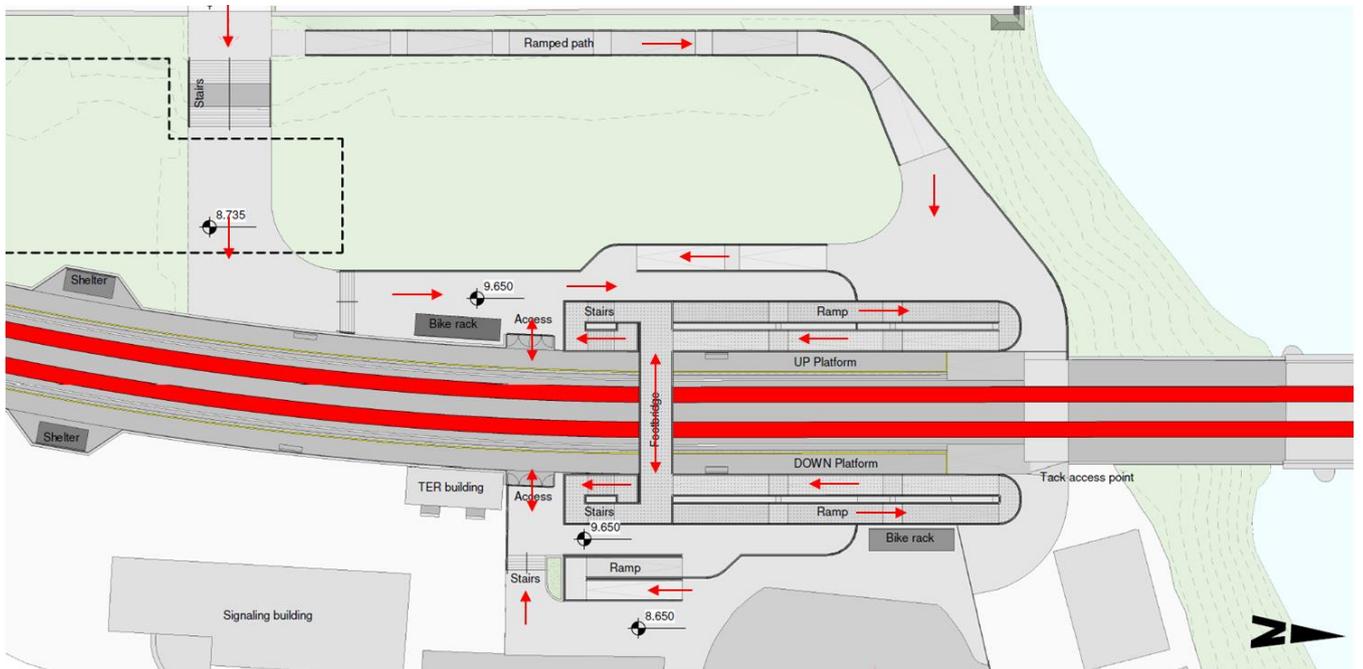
Proposed Heuston West Station Plan & Detailed Access Routes
